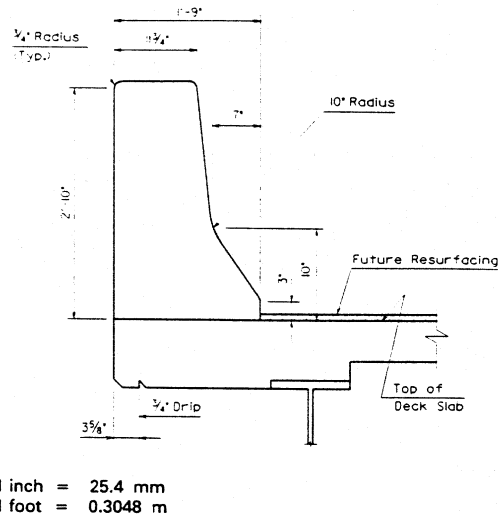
Standard New Jersey barrier bridge parapet to be used where there is no walkway on the bridge.
